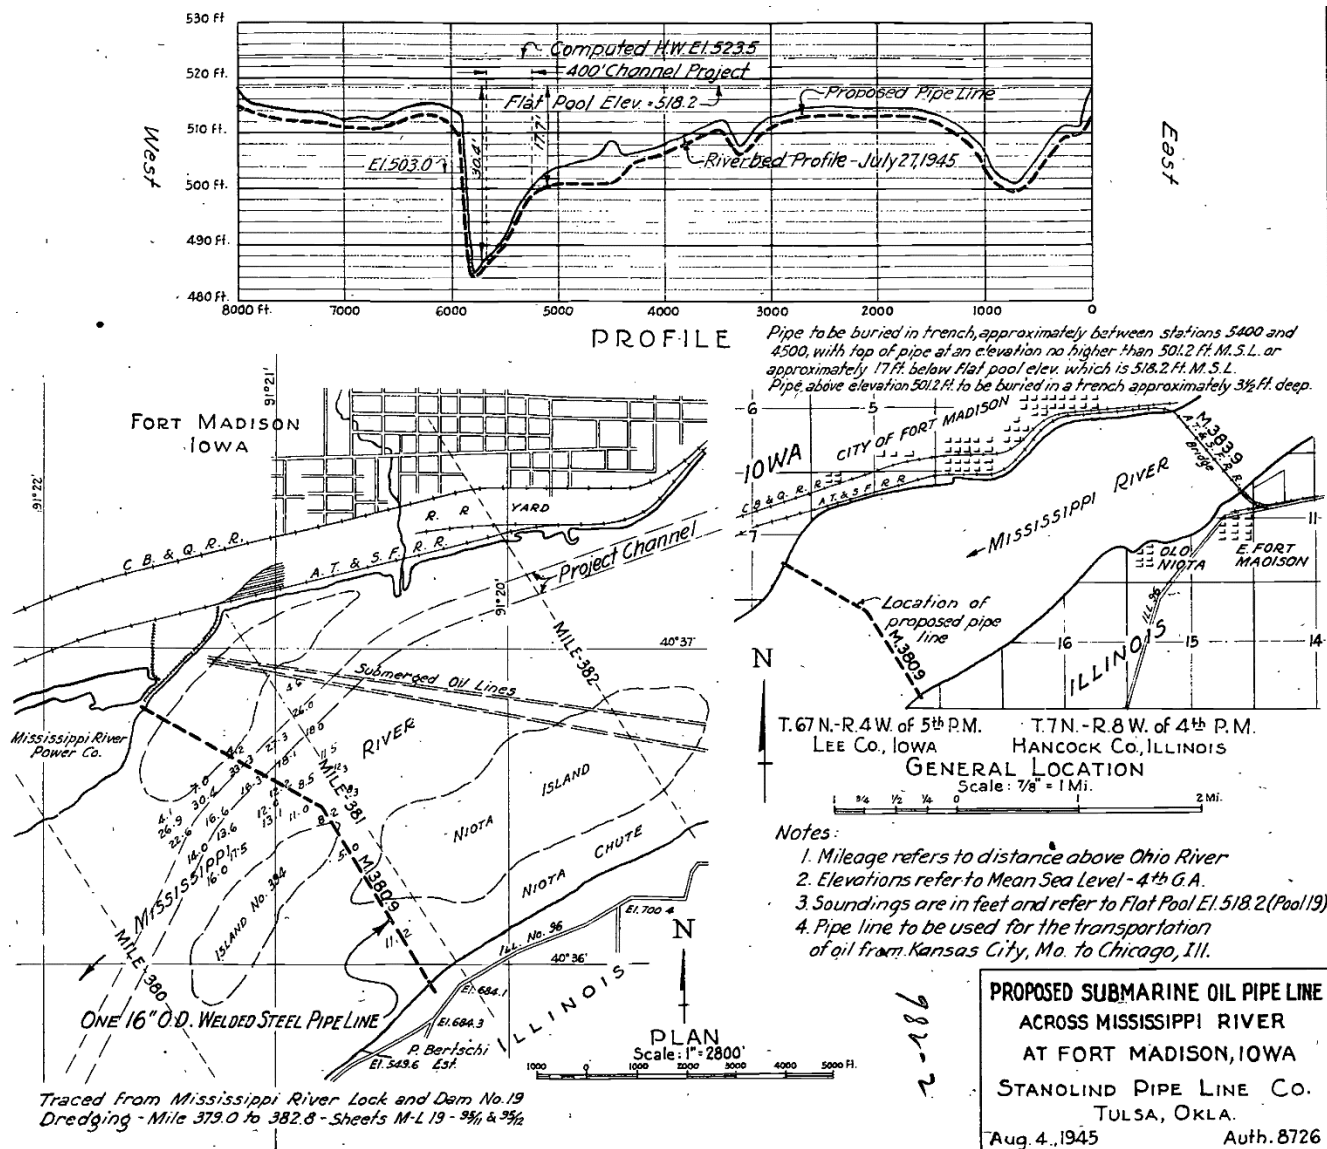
1945 Plans attached to the permit from the War Department authorizing Stanolind Pipeline Co. to construct the 16-inch pipeline under the Mississippi River.
